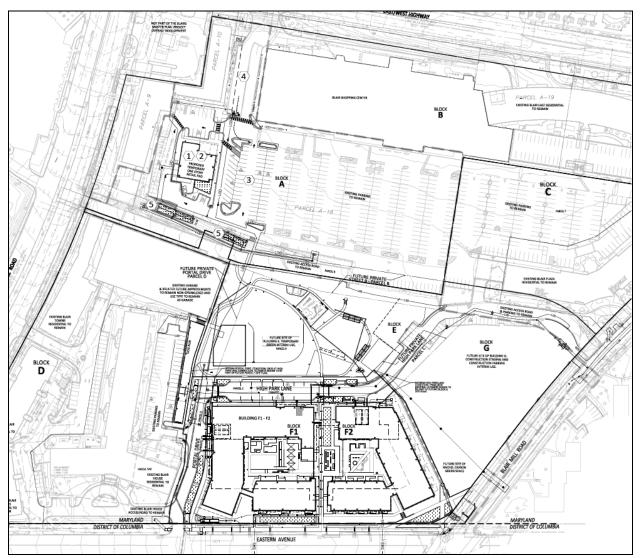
Proposed Site Plan Amendment No. 82014017B
